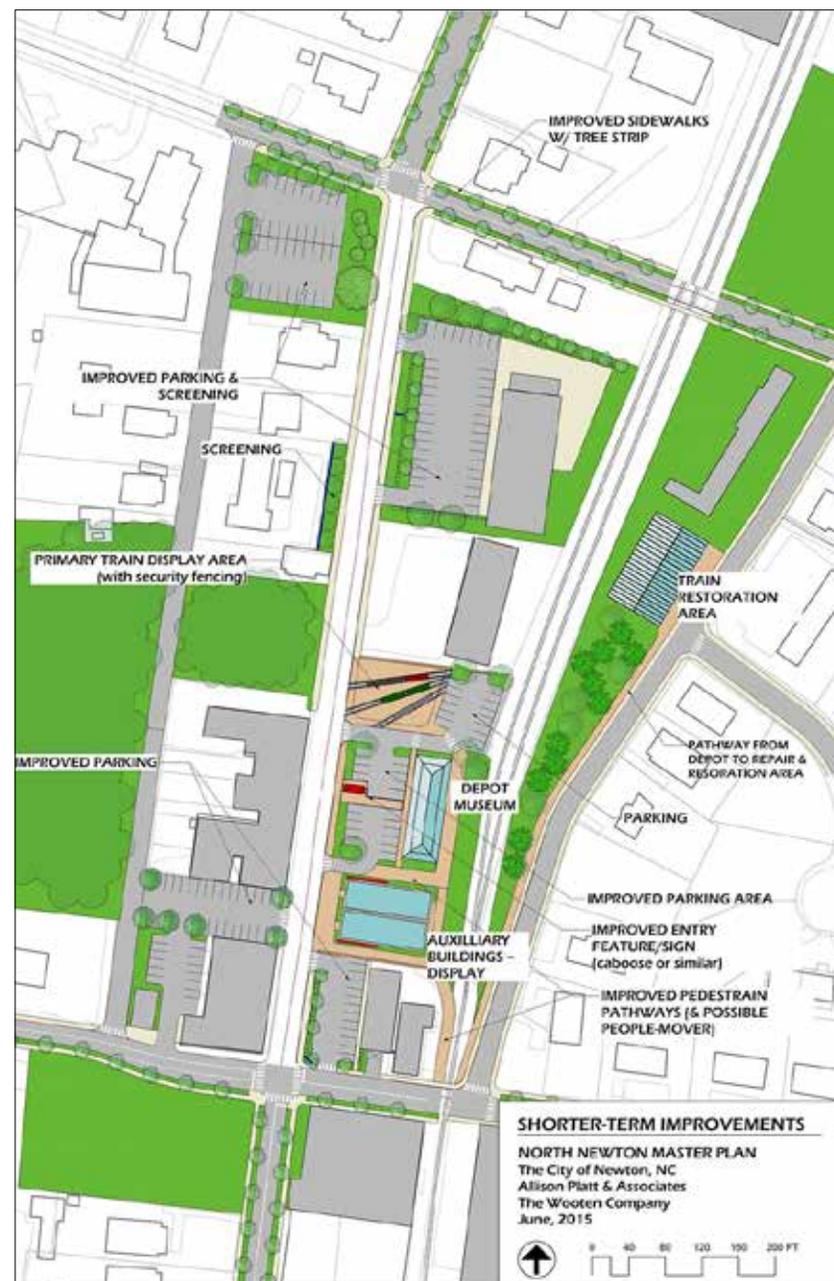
Plan showing shorter-term improvements to the North Newton area.
